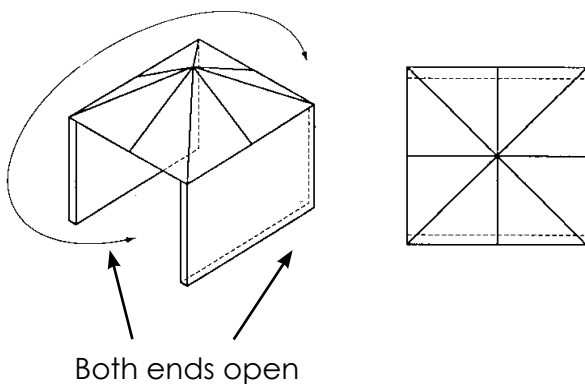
OUTDOOR AREA –EXAMPLE 4
